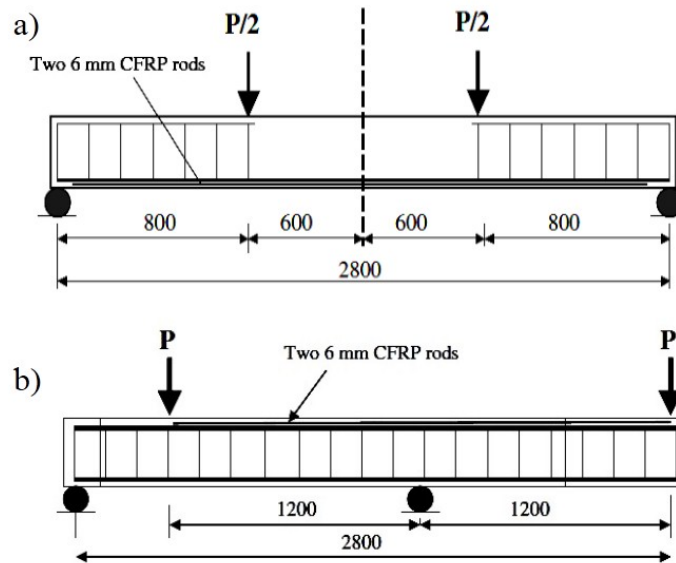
Tested beams by Al-Mahmoud et al. (2010), a) four point-loaded beams, b) cantilever beams (dimensions in mm)
